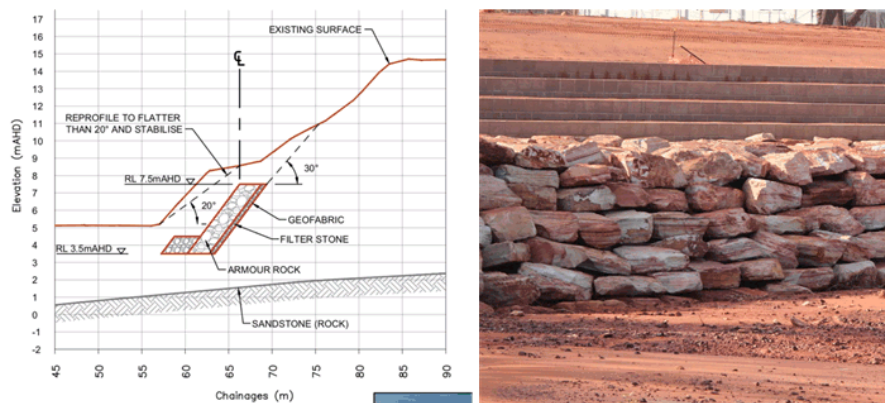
Typical section of Option 1 (left) and example low crested revetment (right).
